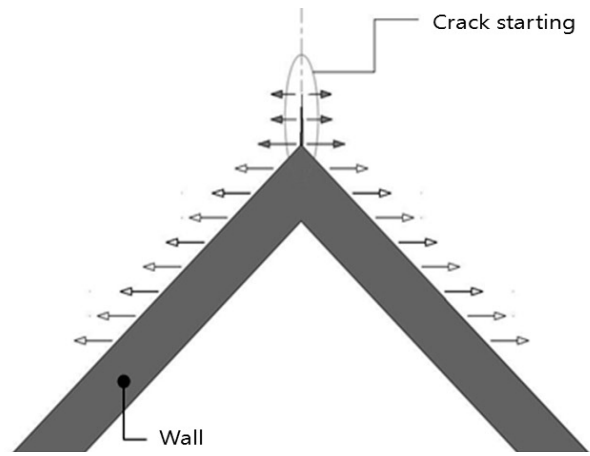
Causes of the crack at the edge of concrete slab (Detail 'A' of Figure 9)
